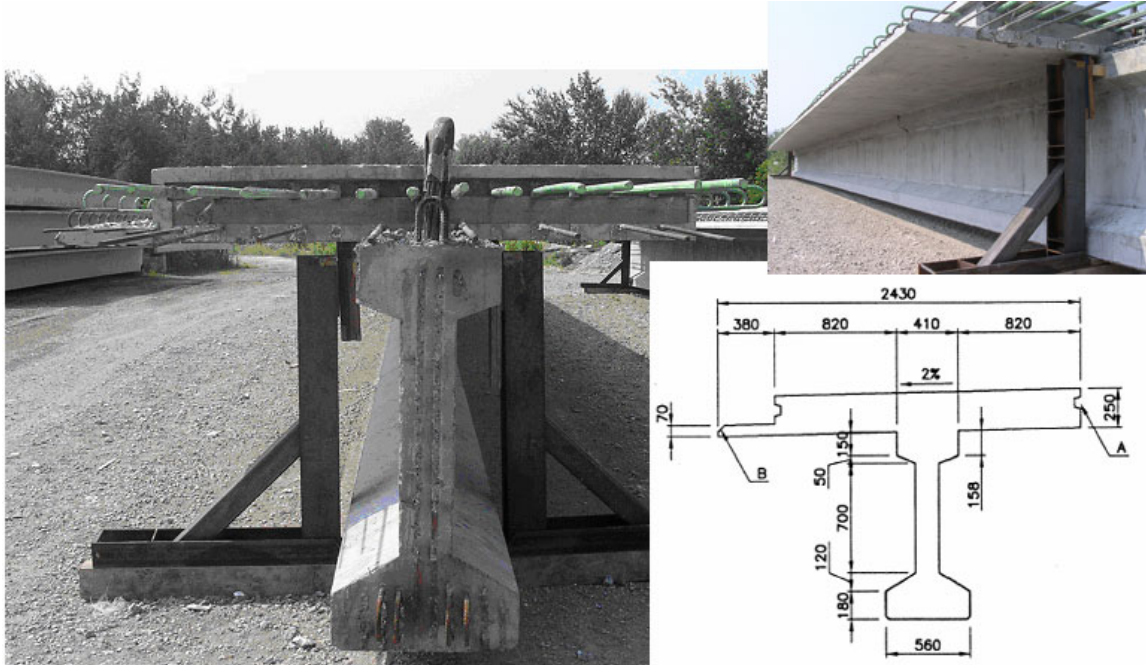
Typical T-shaped Girder Unit with Dimensions
